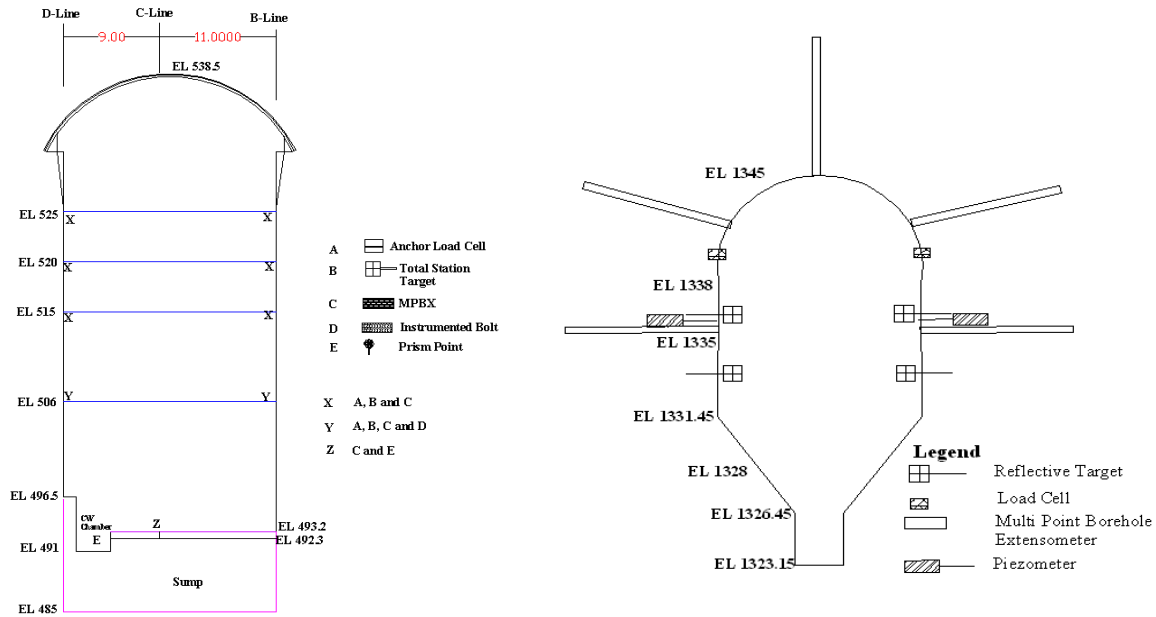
Location of instruments in a section of machine hall cavern and desilting chamber
